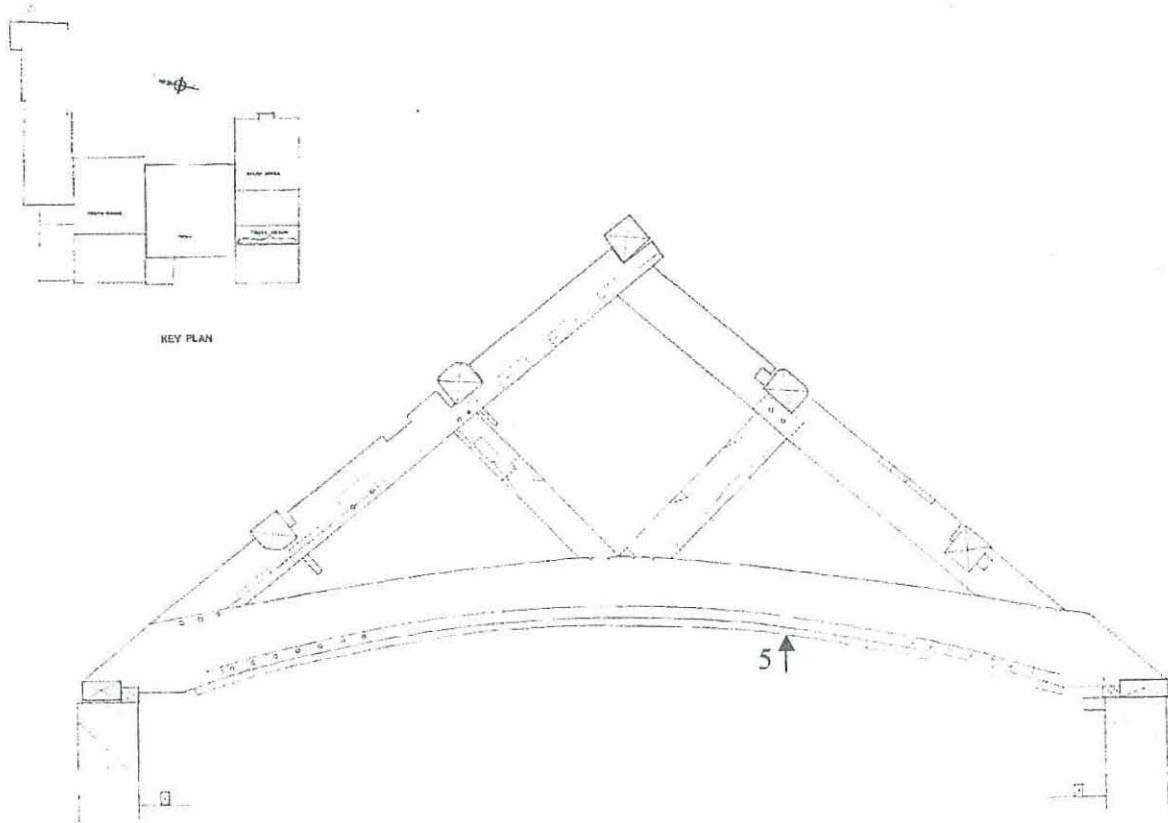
Elevation of western roof truss. South wing, Baguley Hall. Location of sample 5
